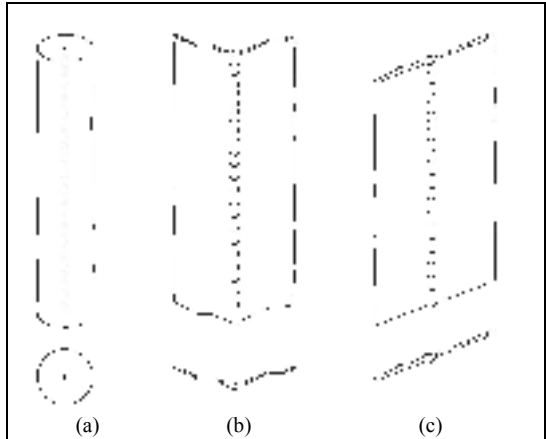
Jet Grouted Column (a) and Jet Grouted Panel (b,c)
